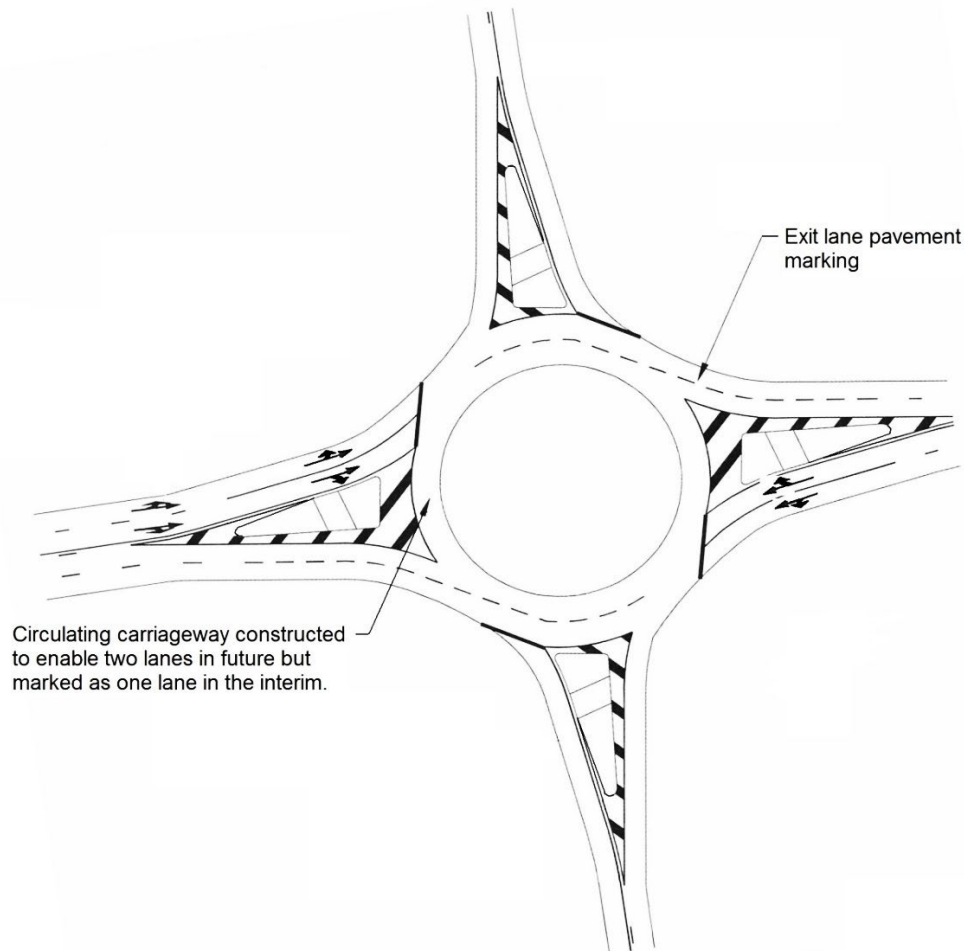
Multilane roundabout with a reduction to one lane, enabling future upgrade to dual carriageway
